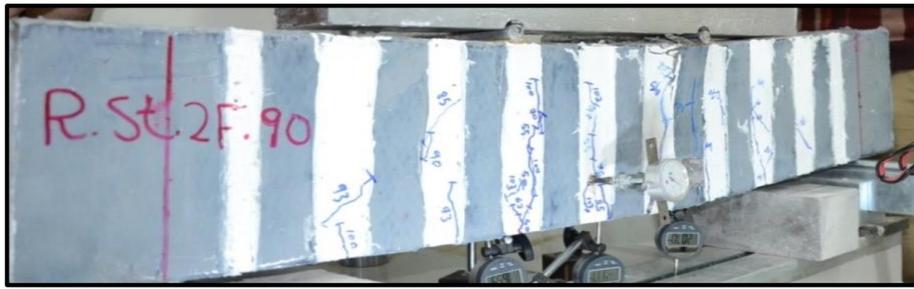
Crack pattern of beam (R.ST.2F-90°)
